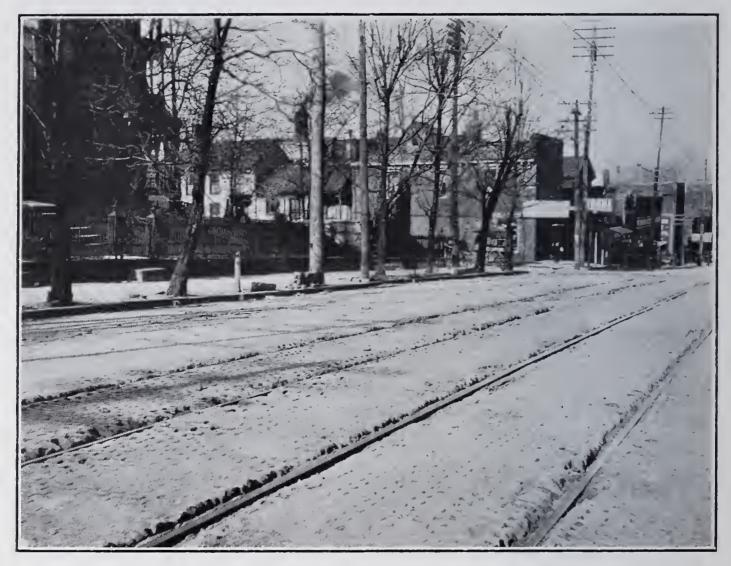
A piece of faulty track construction, where light "T" rails are used with vitrified brick paving without foundations. Ties laid on natural soil.
